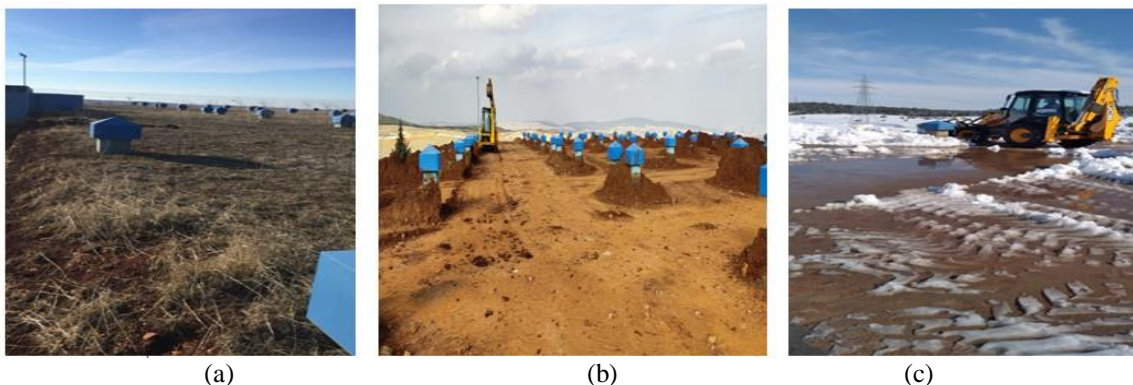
(a) Water Tank Roof (b) Removing Soil From Roof (c) Cleaning The Roof
